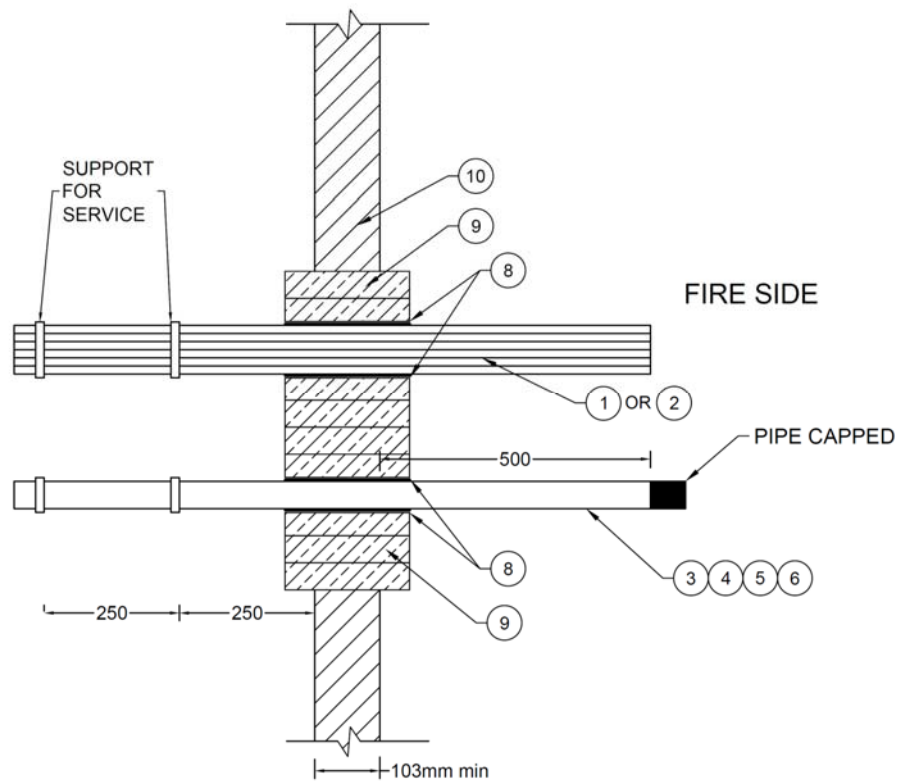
Typical details for cables and metal pipes penetrating 3M Fire Barrier Pillows in plasterboard walls
